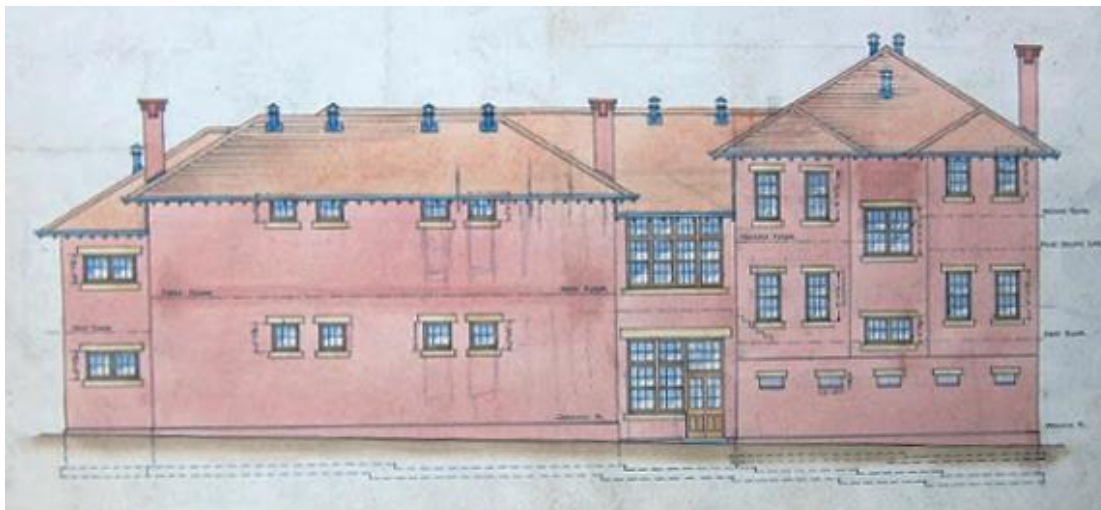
North elevation, 1922 (Source: VPRS 3686/P6/3096)
